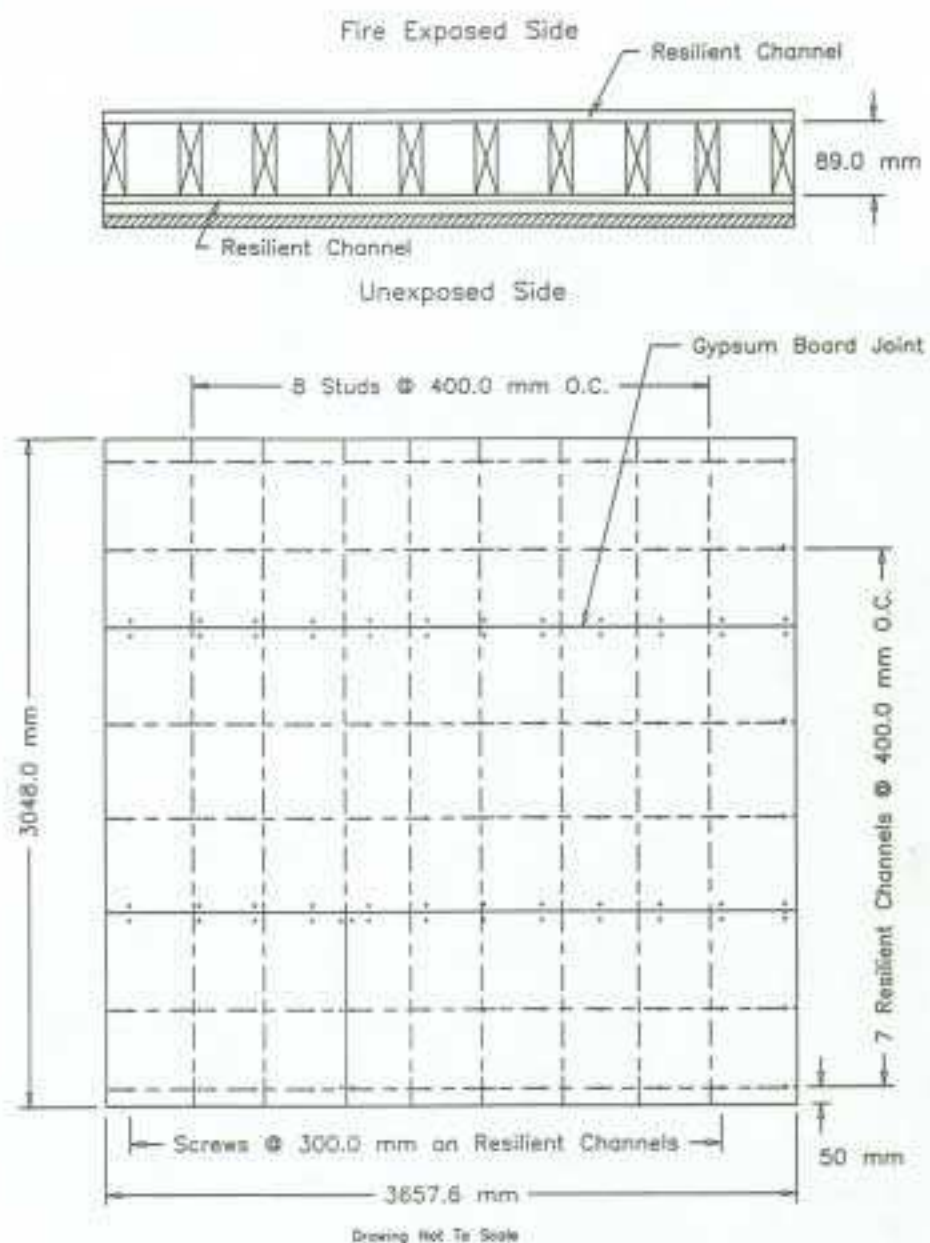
Screw Locations For Wood Stud, 1x2 Gypsum Board Layers, Full-Scale Assembly, Resilient Channel on Unexposed Side (Face Layer Unexposed Side)
